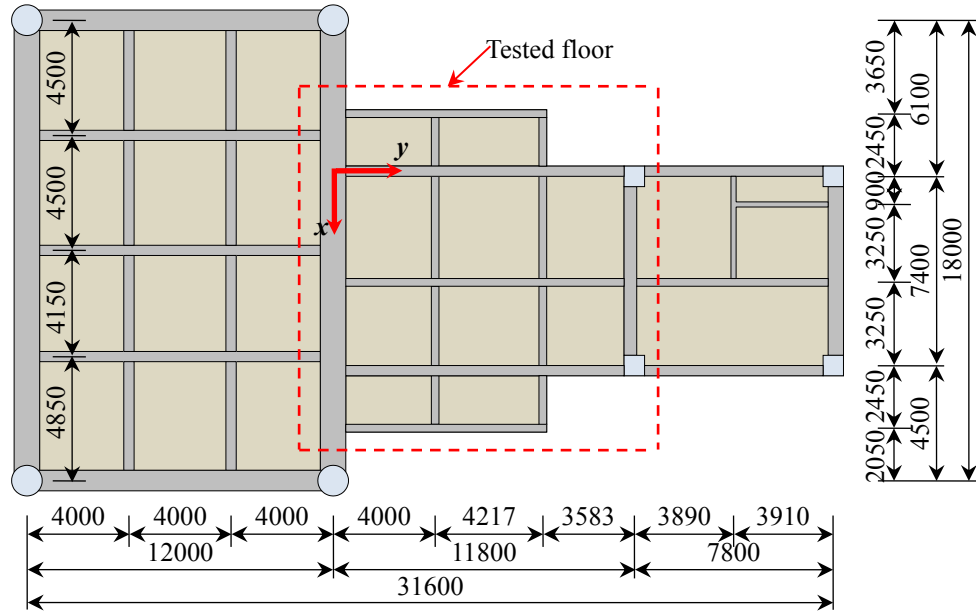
Outline of prestressed concrete floor #2 (all dimensions in mm)
